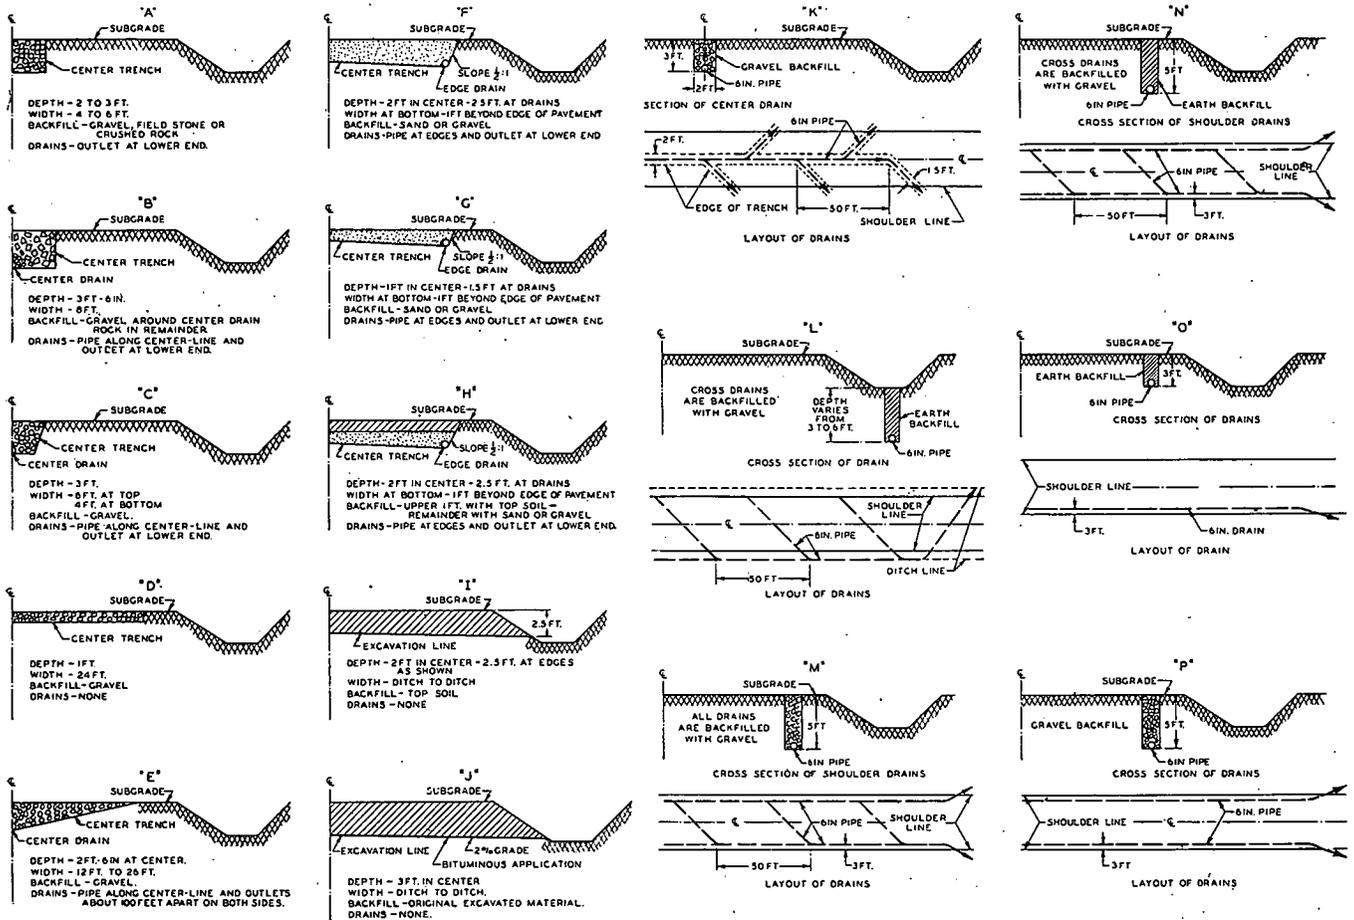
Subgrade Designs Used to Prevent Frost Heave (After Bureau of Public Roads)
